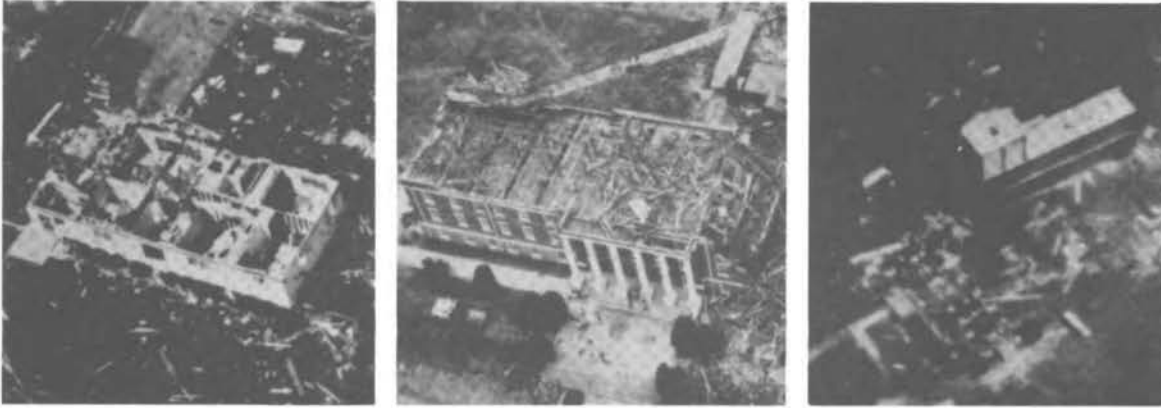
C Considerable damage (F2) on the Fujita scale (winds 113 to 157 mph). Roofs torn off frame houses, leaving strong upright walls; weak buildings in rural areas demolished; mobile homes destroyed; frame houses with weak foundations lifted and moved; large trees snapped or uprooted; railroad boxcars pushed over; light-object missiles created; cars blown off highways.
